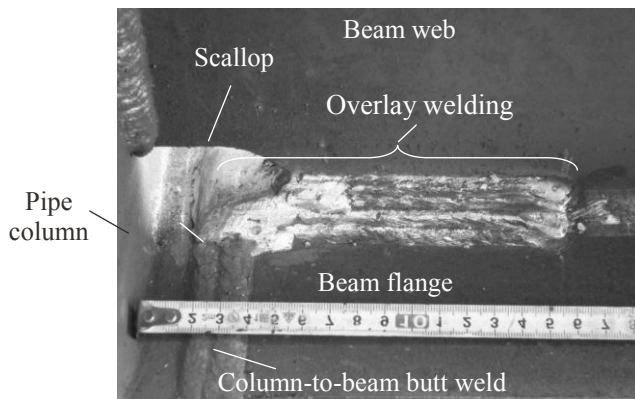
Example of appearance of the overlay welding around toes of scallops (Lower flange side of No.FW-P)
